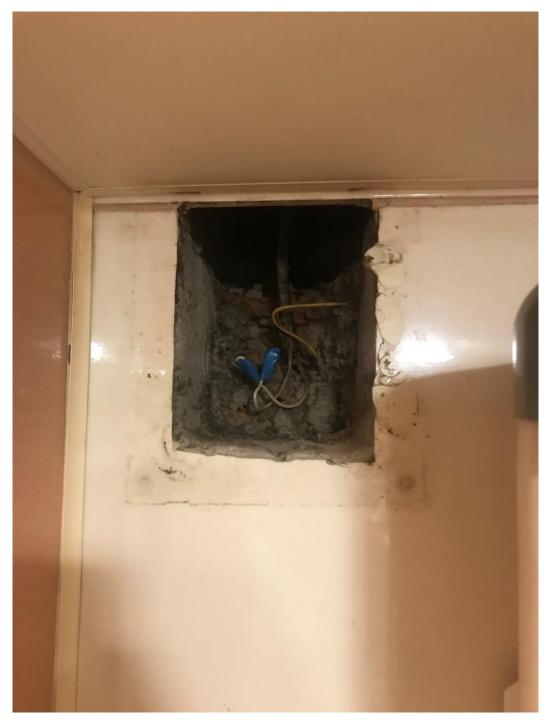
The air vent in the bathroom of a residential apartment in Tomsk without a fan.
